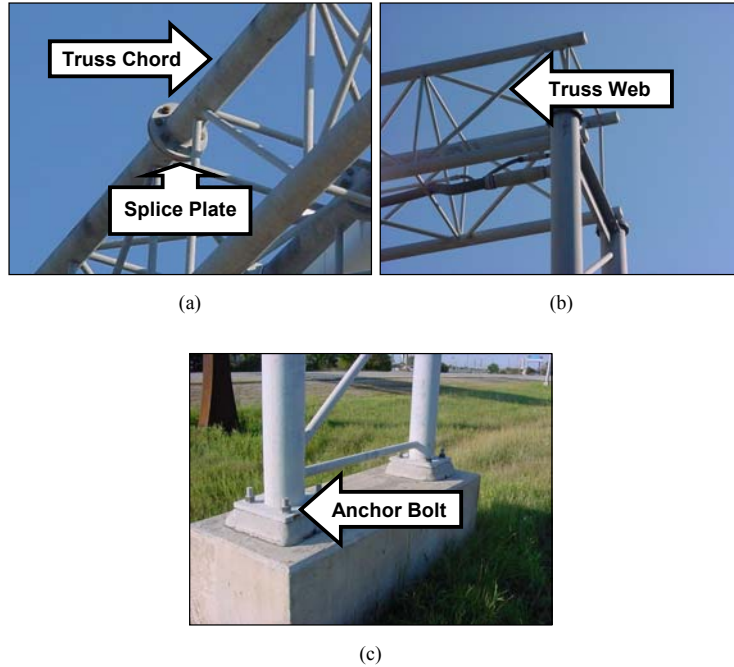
Typical Connection Details Found in Highway Sign Support Structures Composed of Round HSS Members (Ginal 2003).
